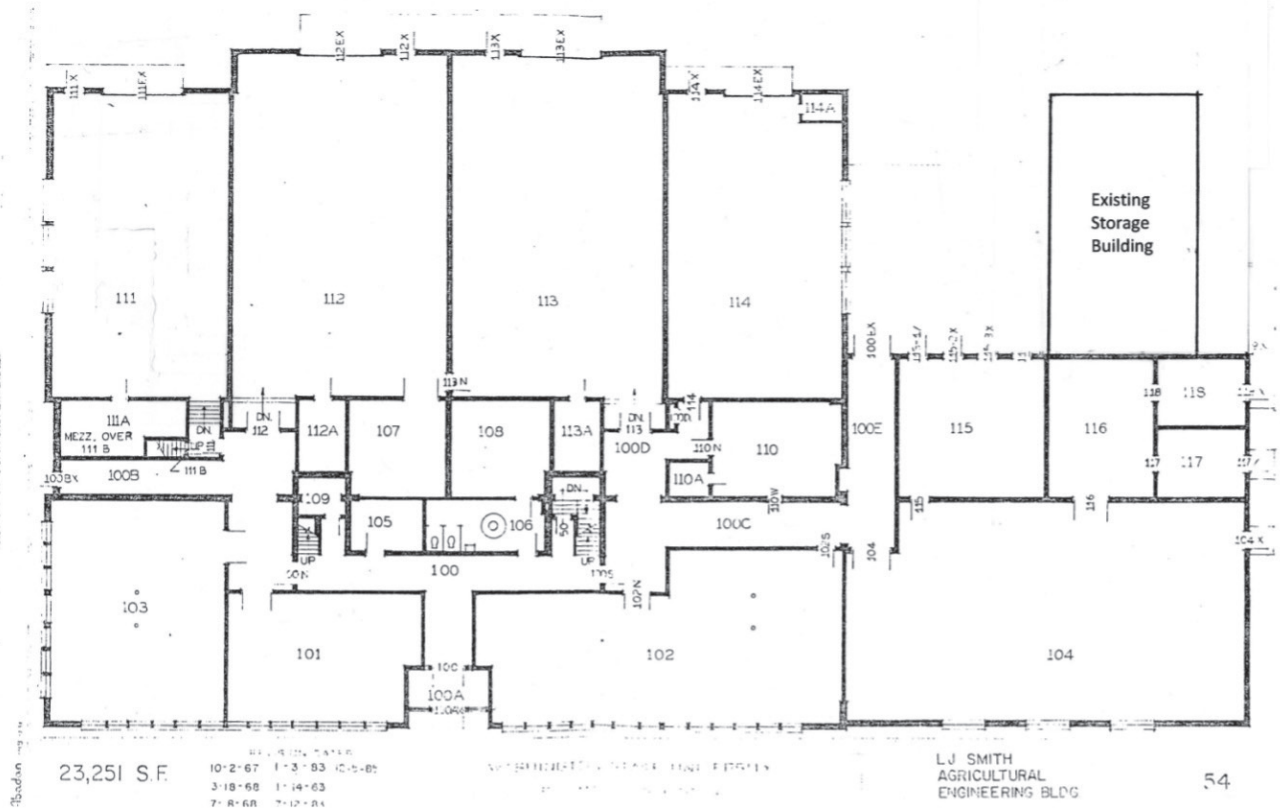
First floor of L. J. Smith Agricultural Engineering Building in 1968 after the addition and remodel.
